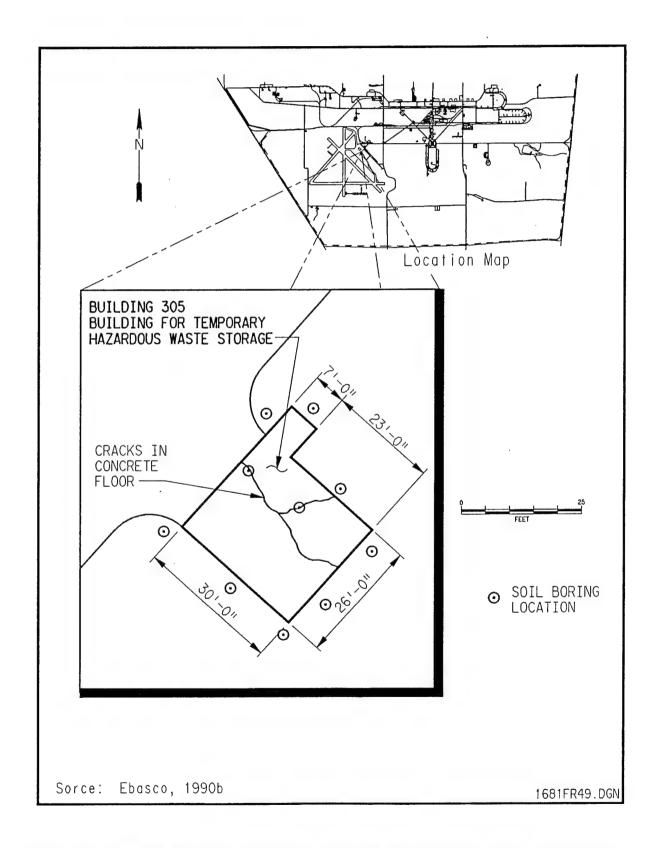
Proposed Sampling Locations at Building 305 Temporary Waste Storage Area
